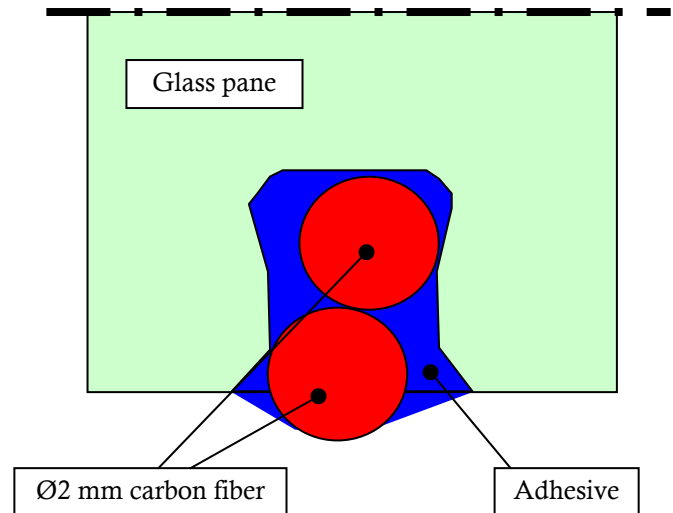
, Close-up of bottom of girder cross-section with reinforcement geometry for specimen 1.
